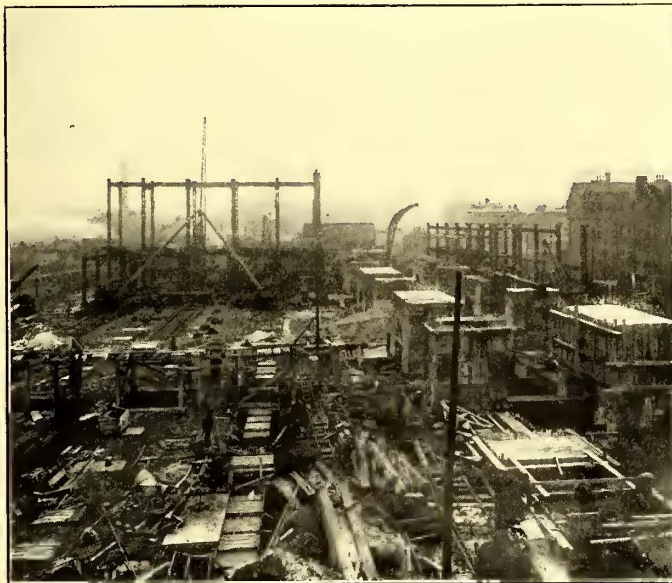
ENGINE AND BUILDING FOUNDATIONS, CHELSEA GENERATING STATION, LOOKING WEST
